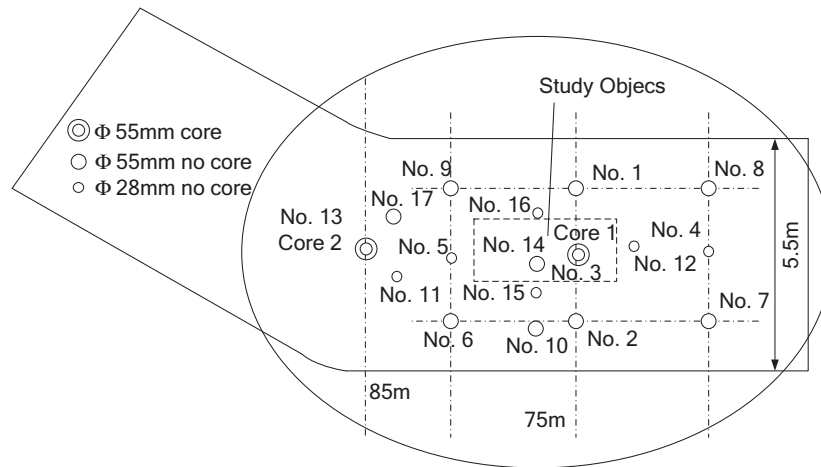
Layout of the drill holes (plan view of RTV roadway).
